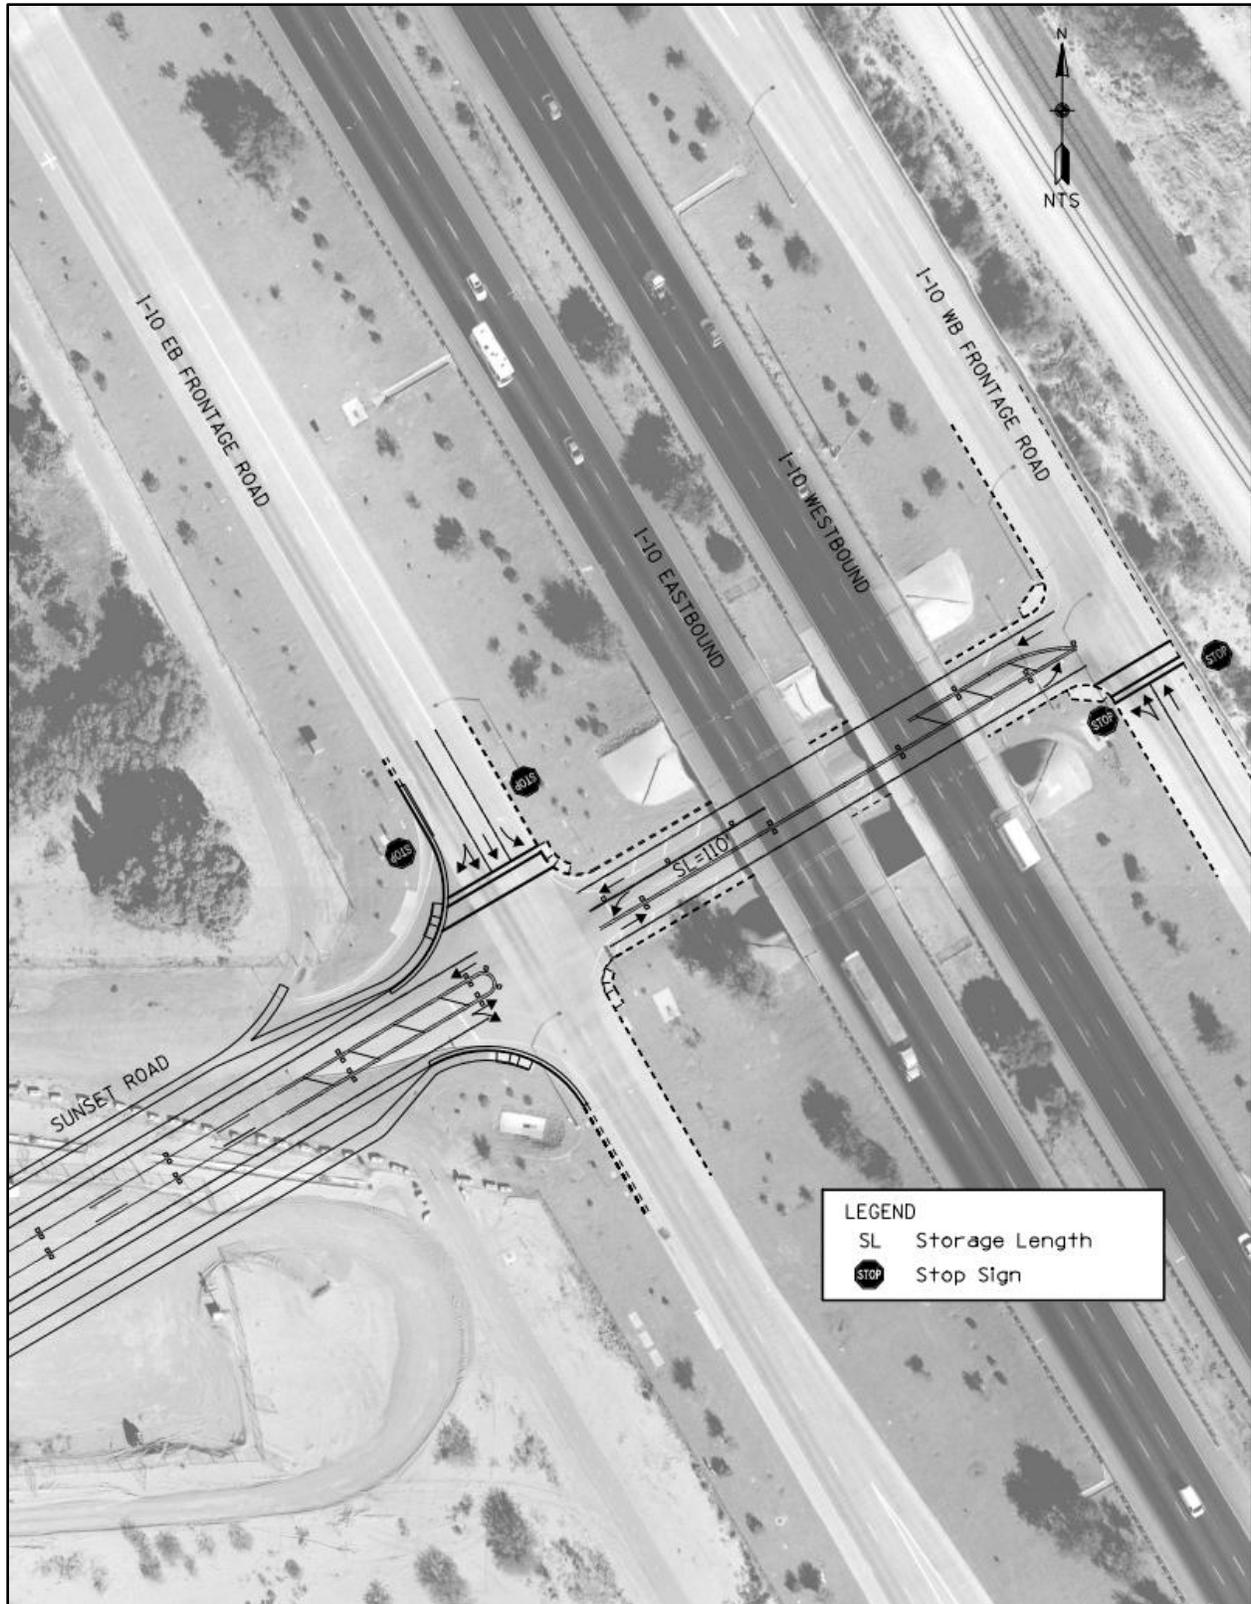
Proposed Lane Configuration at I-10/Sunset Road TI
